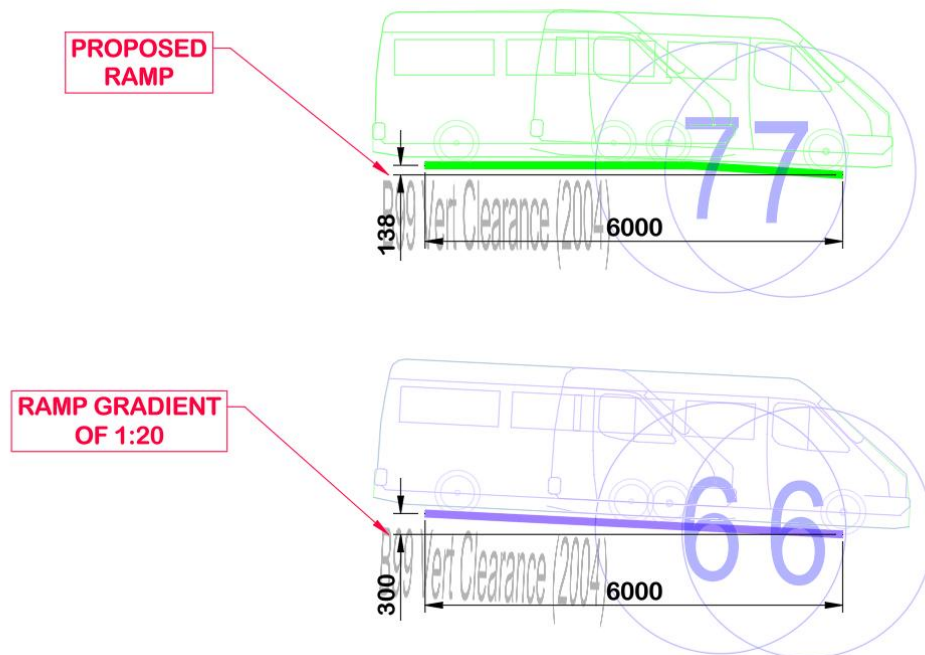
Proposed ramp and 1:20 gradient ramp cross sections
